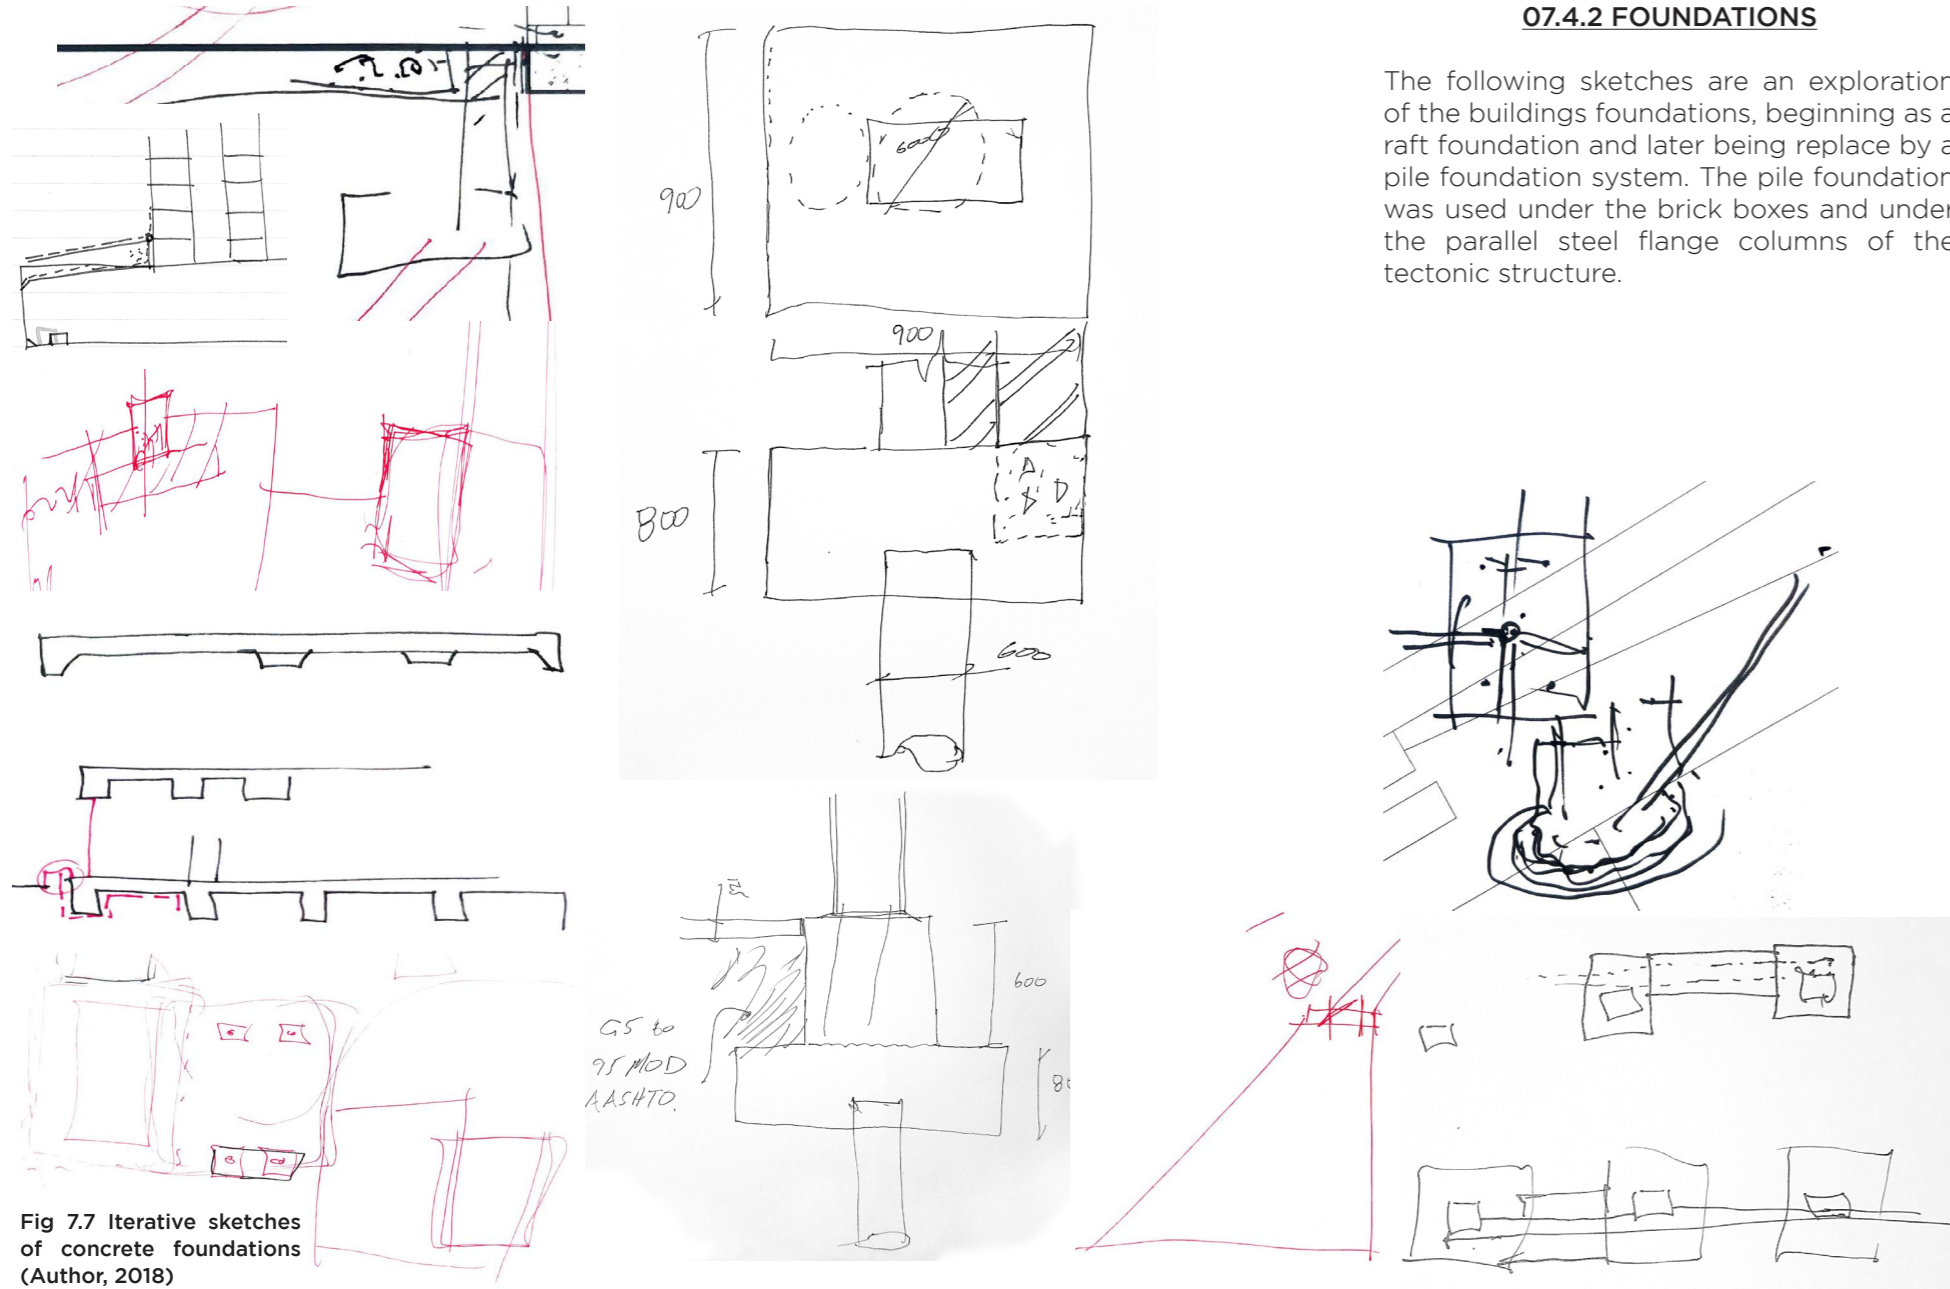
Iterative sketches of concrete foundations (Author, 2018)
